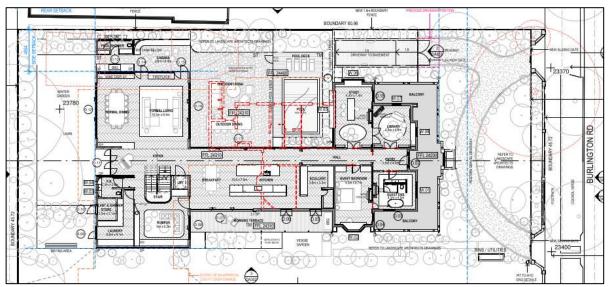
Proposed ground floor plan. Red dotted lines shows proposed demolition of original structures and tree removal.
